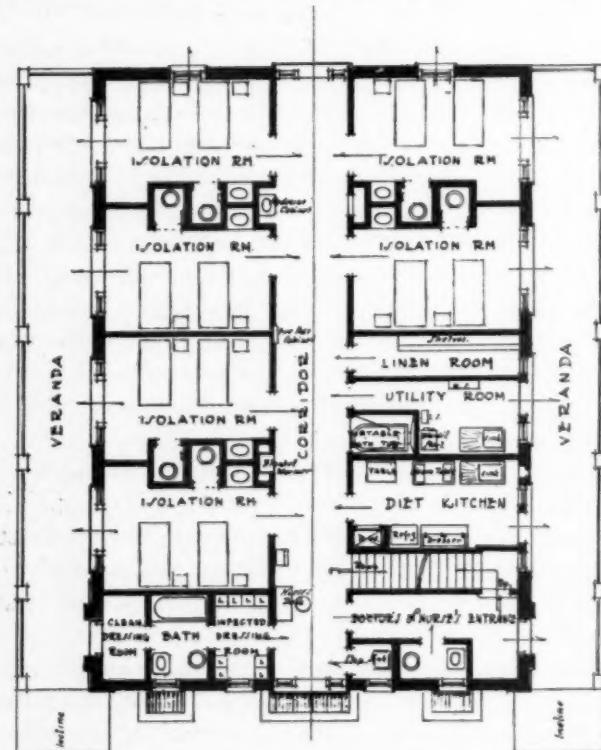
Hurley Hospital. Isolation unit. First floor plan.
